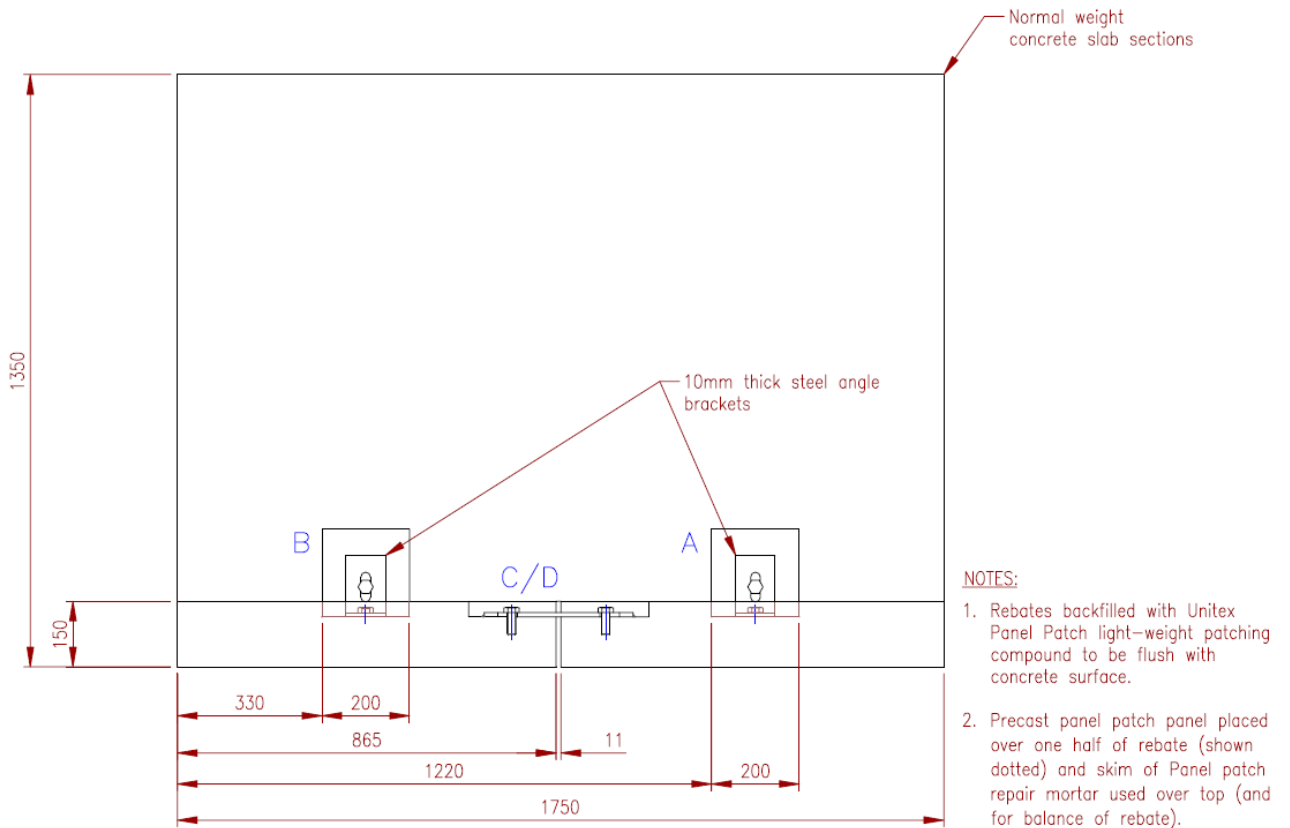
Concrete slab joint construction detail (2) as tested in WFRA 40938.
